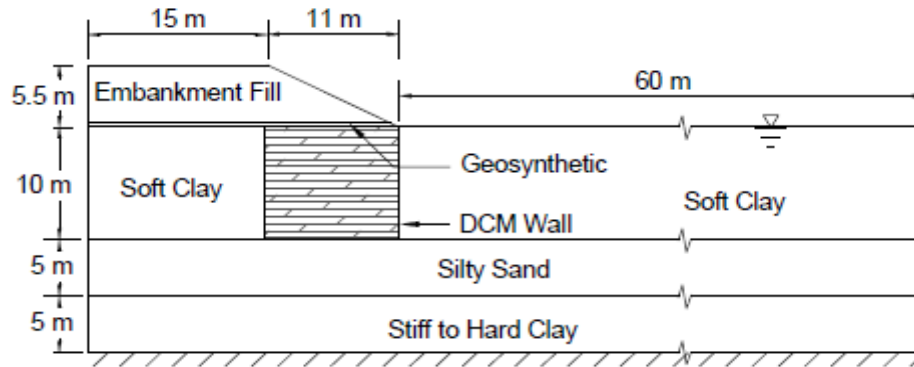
Geometry of the embankment and layout of DCM walls and geosynthetic reinforcement layer
